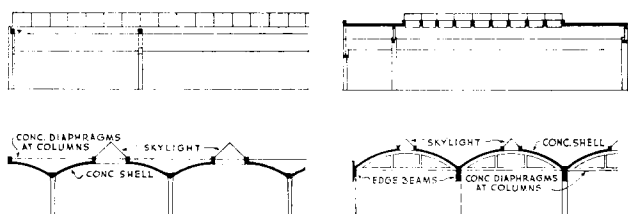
Butterfly-type concrete shell roof for spans up to 40 by 60 ft.
